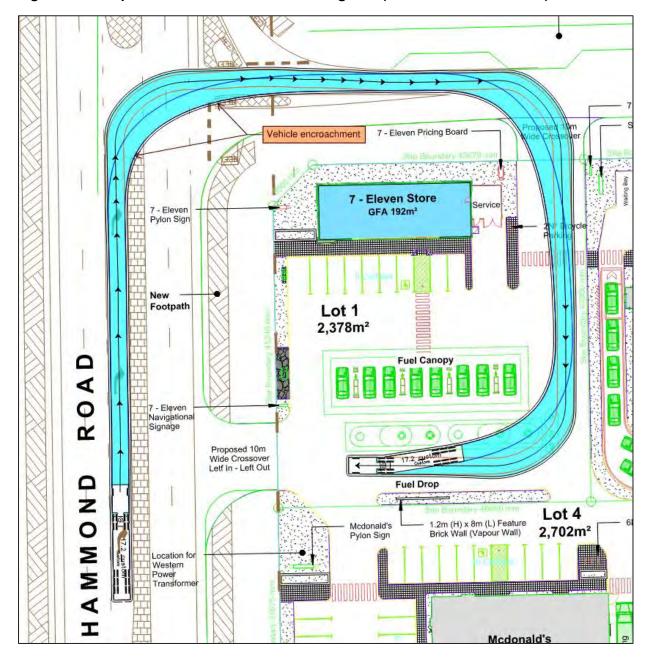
Swept Path – 19m Semi Trailer – Right In (Hammond Road South)
